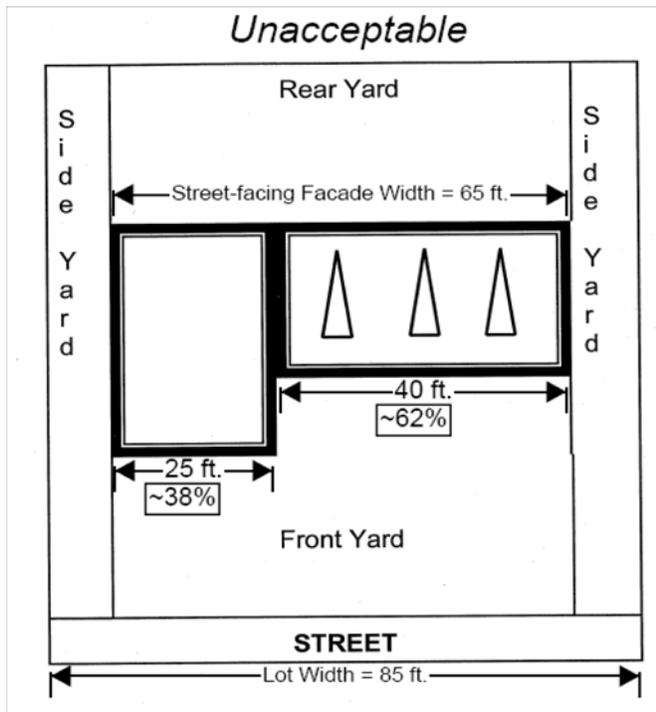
A - Unacceptable Width of Street-facing Garage on a Lot $>$ 50 ft. Wide
